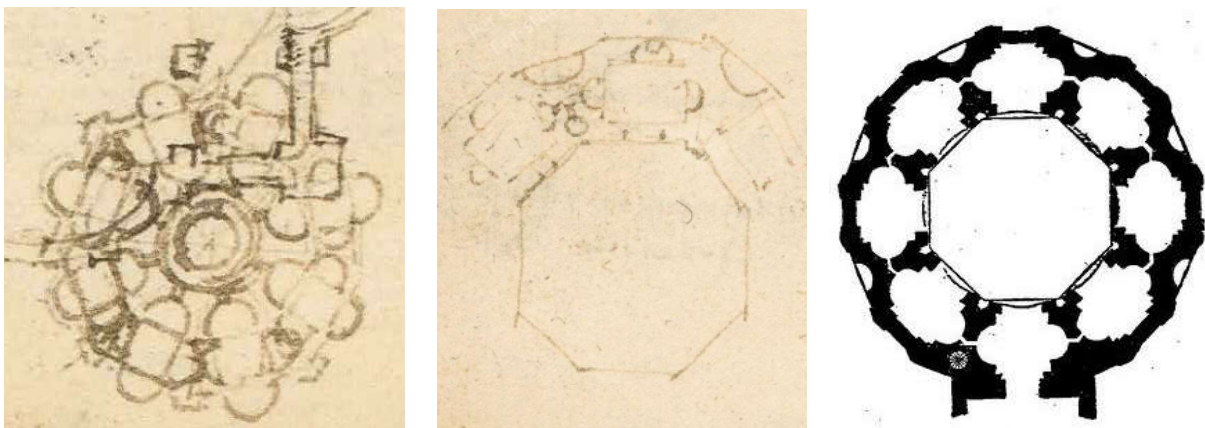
From left to right: (1) the plan of the church in f. 93v, (2) the plan of Brunelleschi’s *Rotonda degli Angeli* as depicted by Leonardo in f. 11v of Ms. B, (3) its actual plan.
